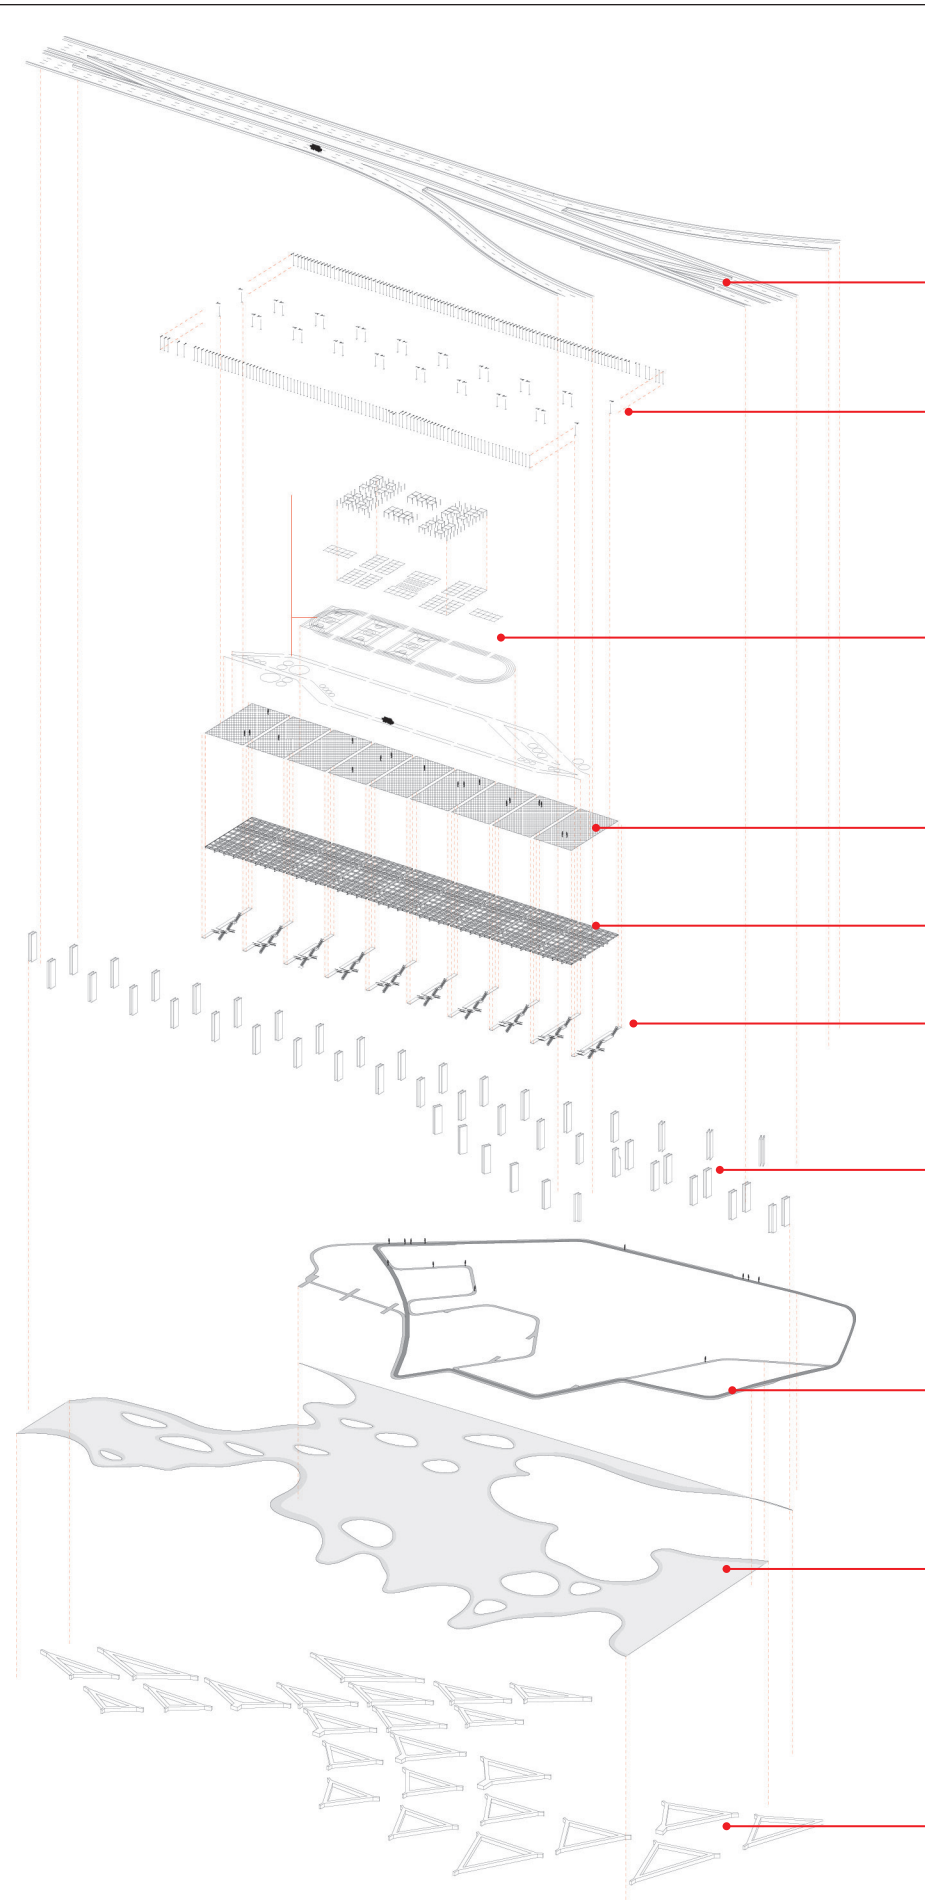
Exploded Axonometric of P.L.A.T.F.O.R.M.
